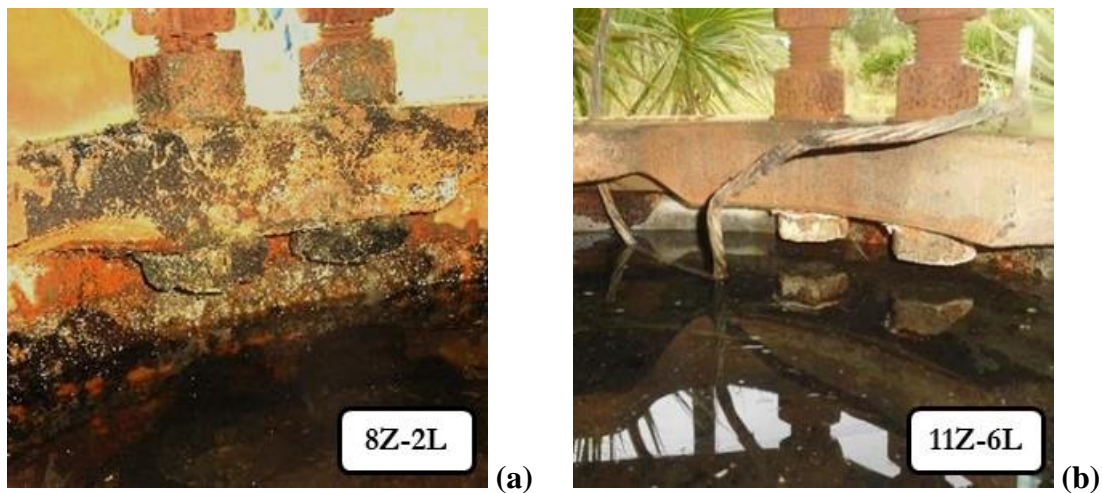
Water pooling in GS caisson foundations leading to: (a) sludge build-up; and (b) pack-rust damage on GS nuts.
